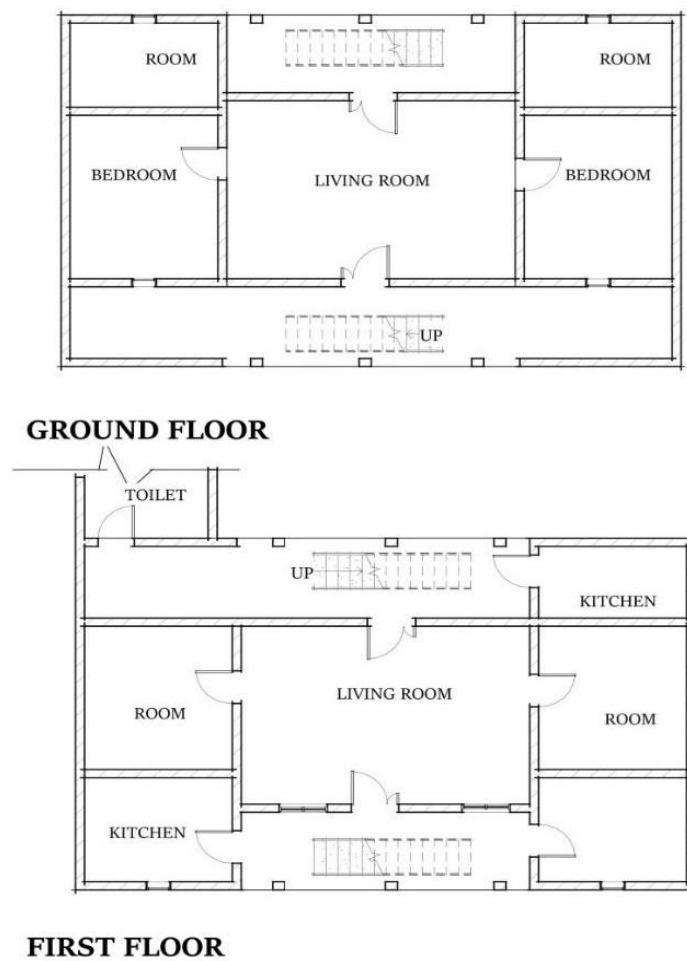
The Second Residential Storey Building, Ota (Floor Plans)
